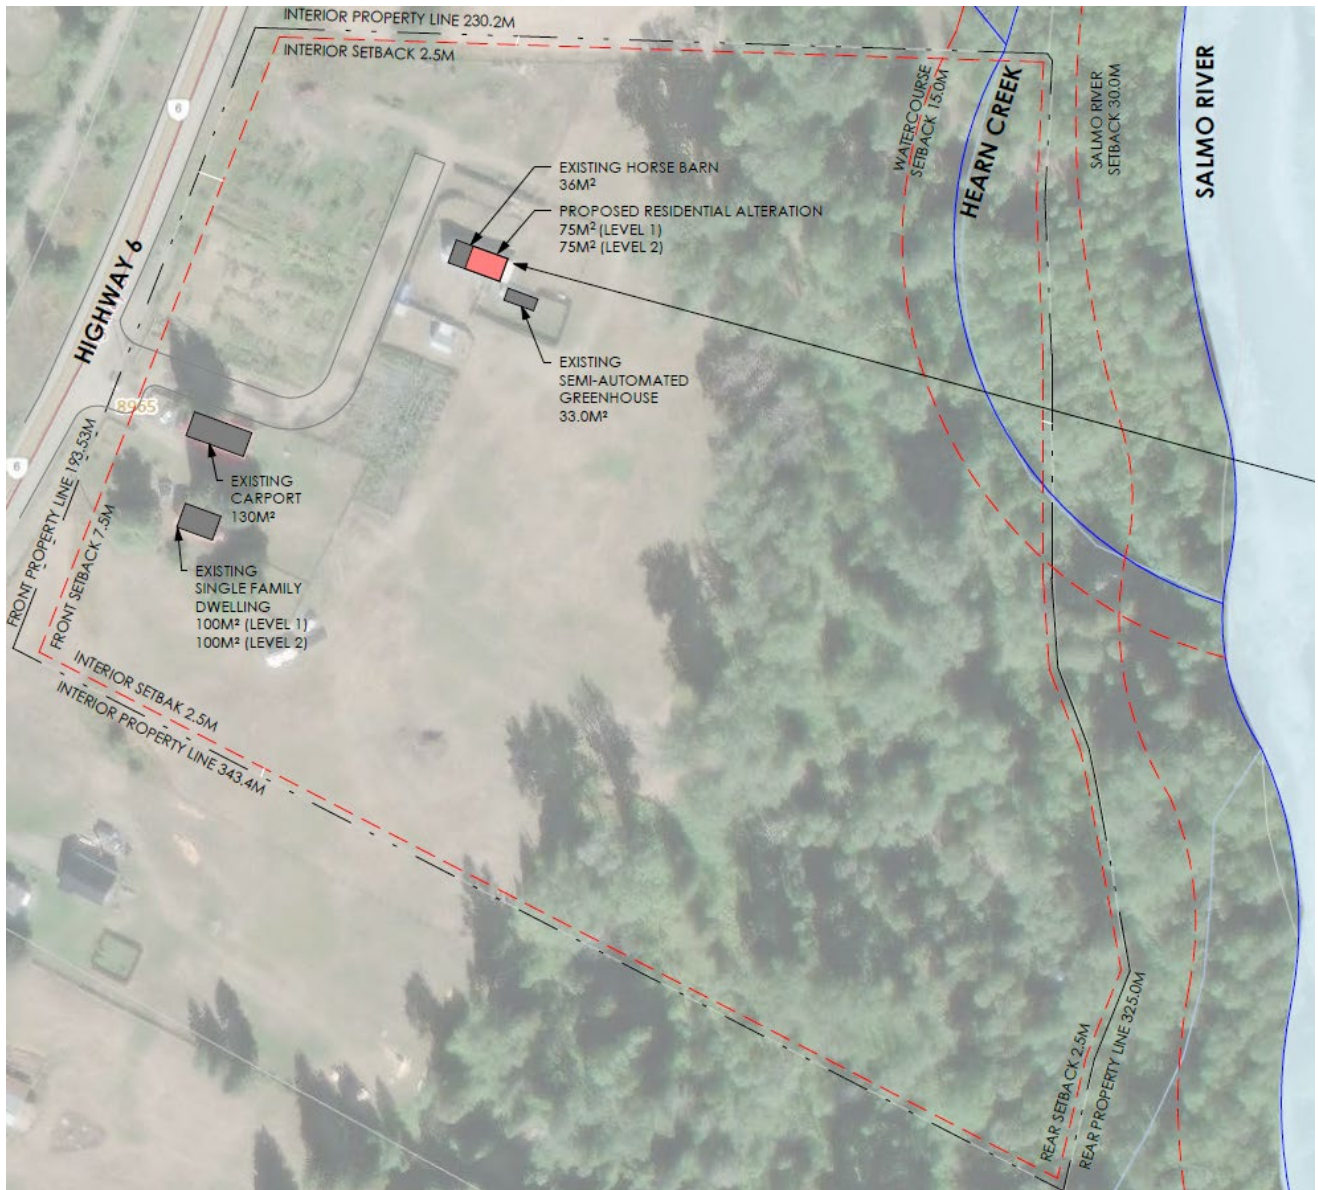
Proposed location of new dwelling (snippet from Site Plan Drawing)
